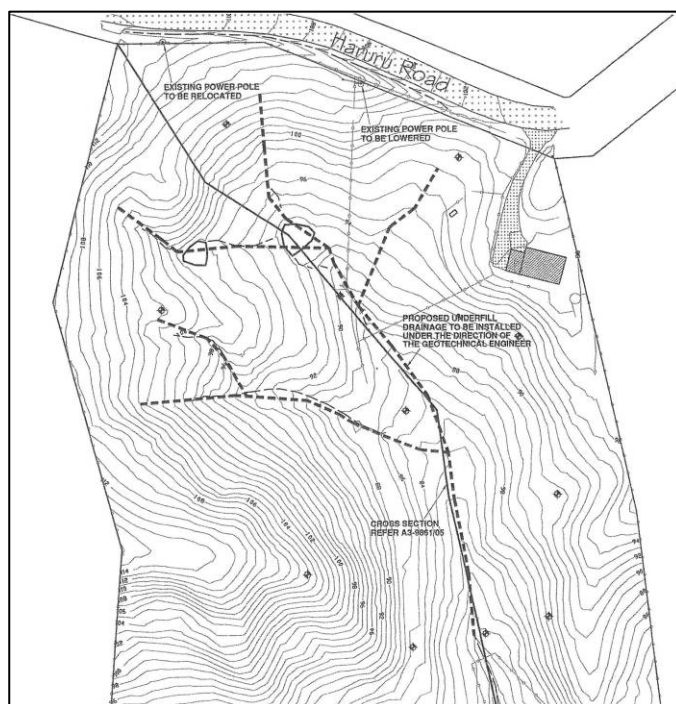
Plan view of site showing contours (1m) and proposed drainage works.
